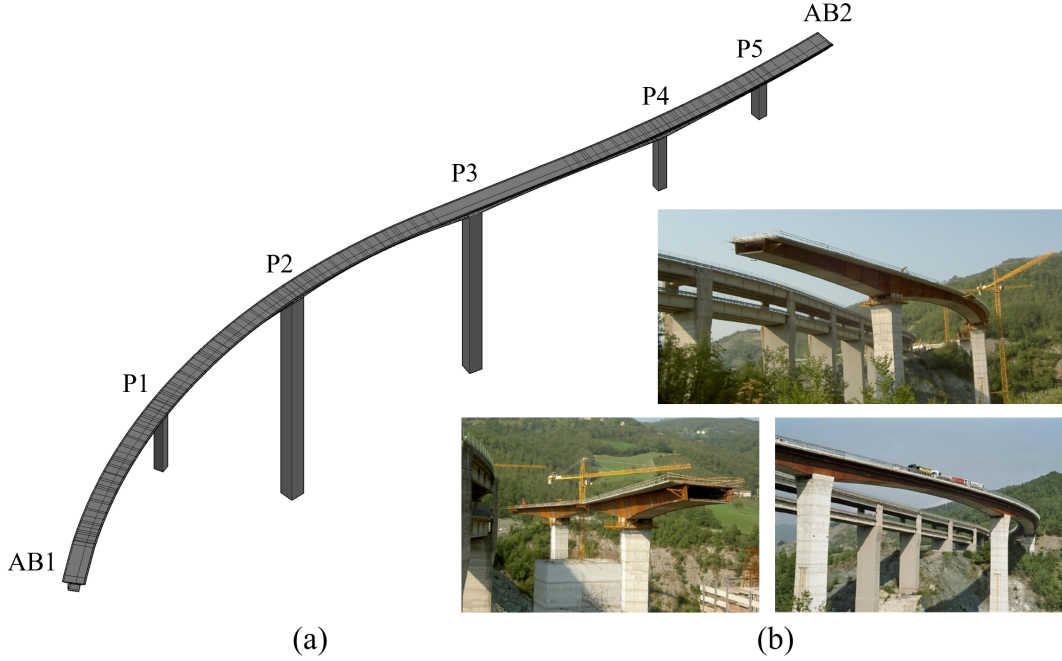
(a) Bridge 3D view. (b) Pictures of the bridge both under construction and in operating conditions.
